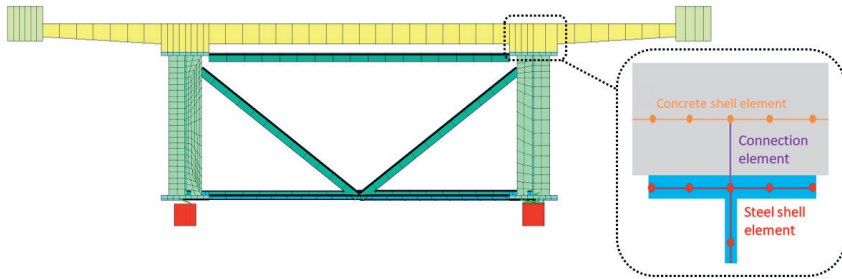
Bridge cross section with a schematic illustration of the steel-concrete interface
